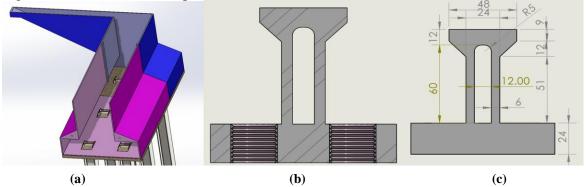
(a) SIP UHPC Formwork (Initial Proposal), (b) Novel UHPC Hollow Stem Abutment with CMP Pile to Pile Cap connection, (c) Dimensions (in inches) of the 40ft Long-Proposed Wall
